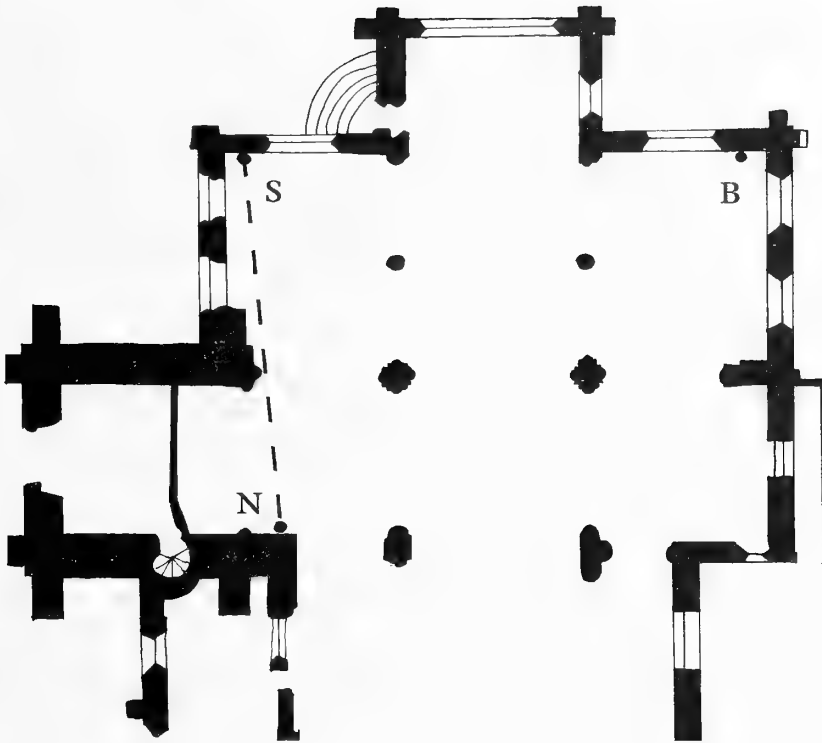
Sketch plan of east end of St Mary's Church, based on pre-1864 floor plan, showing possible locations of the Castle House vault
